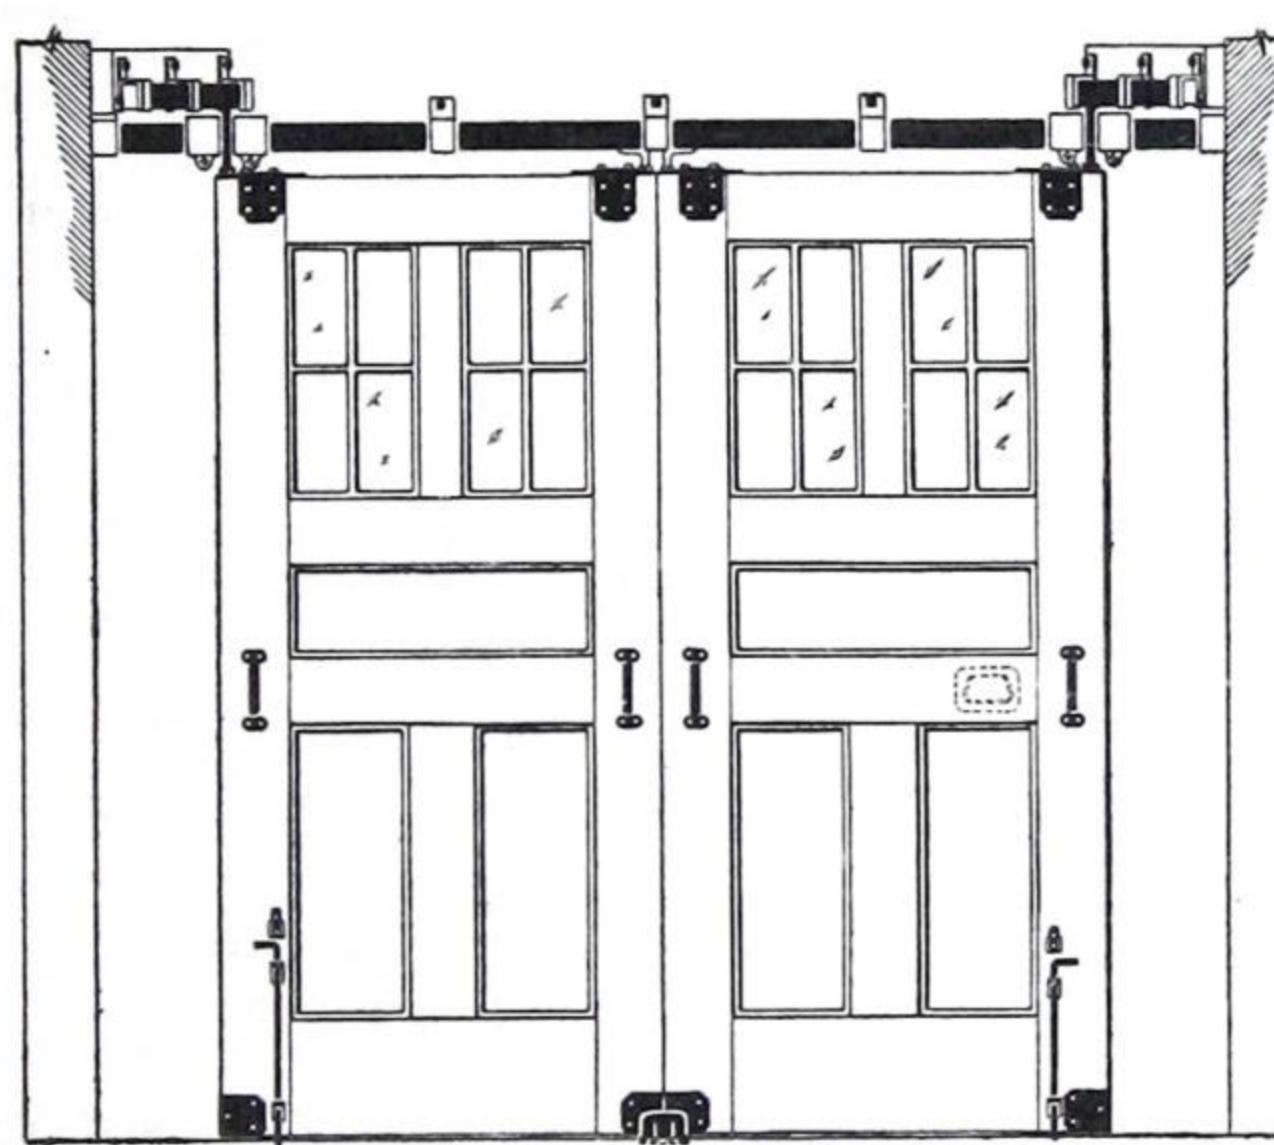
Interior elevation showing Set BB-1, including two 524 Cane Bottom Bolts.
